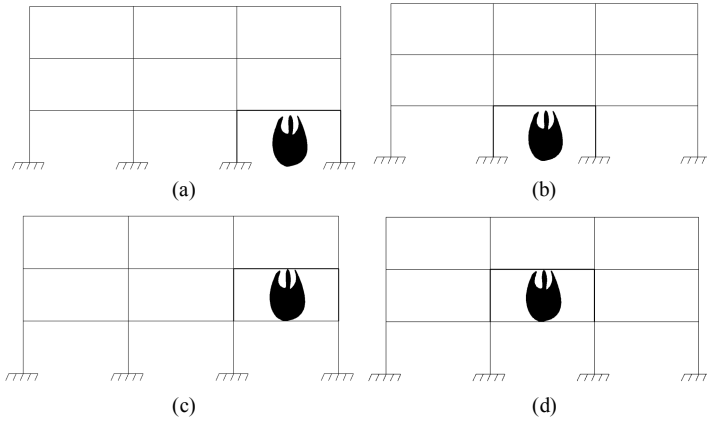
Accepted scenarios of calculated fire: (a) - lower floor - outside span, (b) - lower floor - middle span, (c) - middle floor - outside span, (d) - middle floor - middle span
